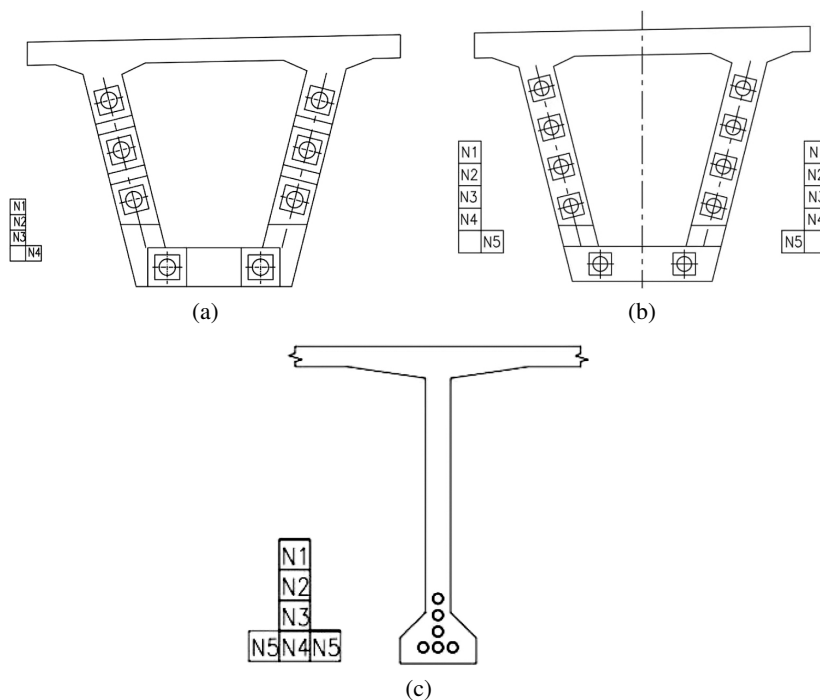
Prestressed steel tendon tension sequence diagram: (a) 20 m small box girder, (b) 25 m and 30 m small box girder, (c) 40 m T-shaped girder
